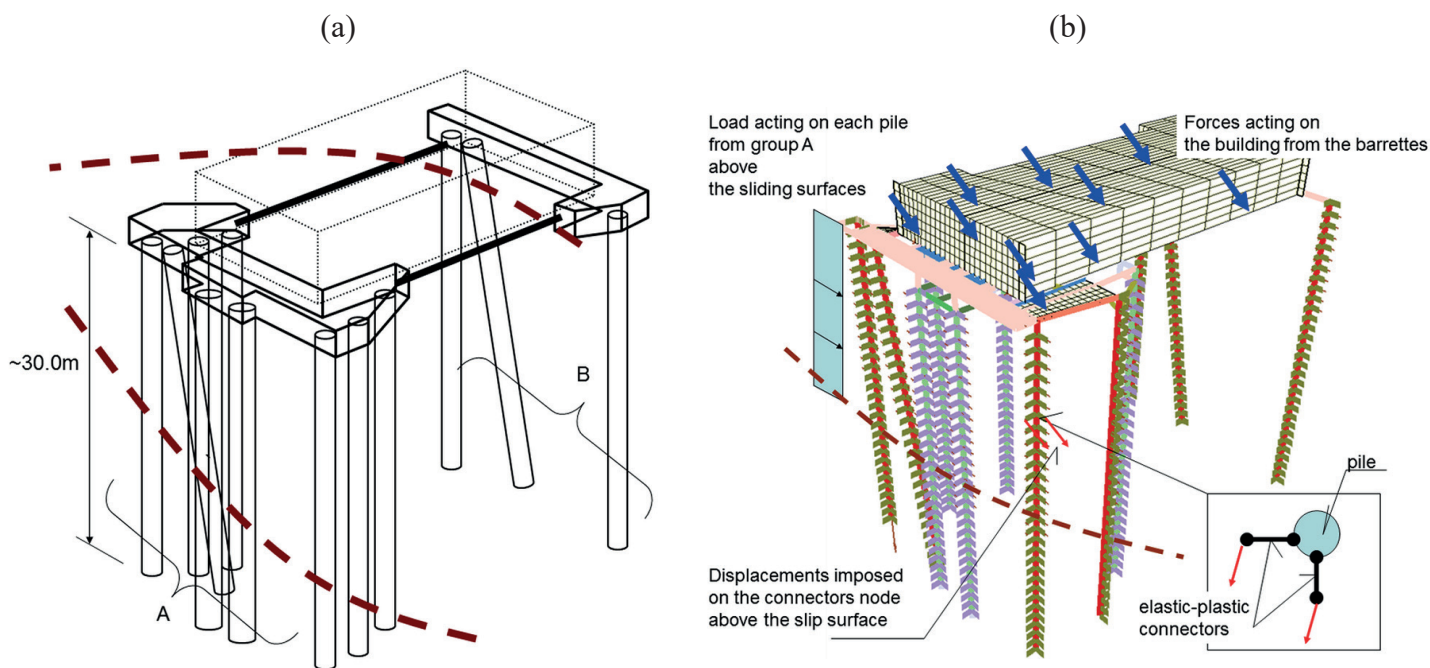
a) An overview of the supporting structure; b) Static schema of 3D frame system and its load
